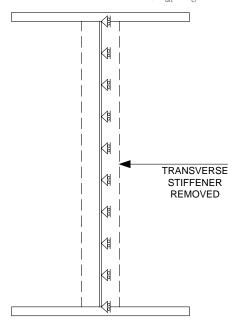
GIRDER SECTION AT STIFFENER LOCATION AND LINE SUPPORT ALONG WEB PLATE
